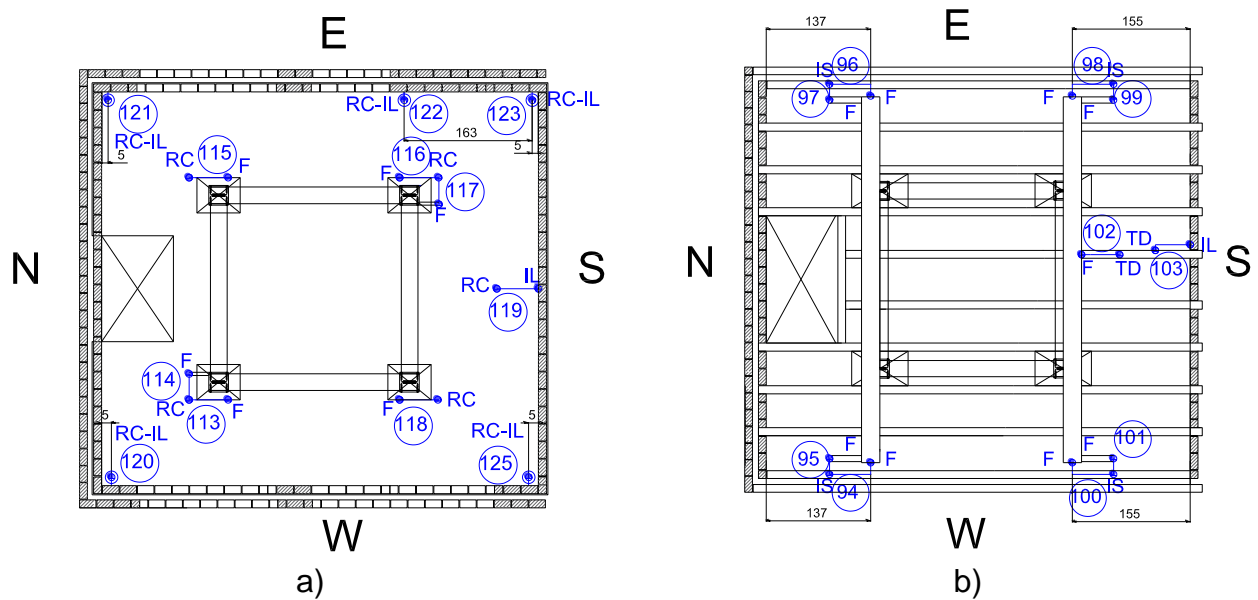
Linear potentiometer plan views: a) first-floor level (R.C. diaphragm); b) second-floor level (timber diaphragm).
